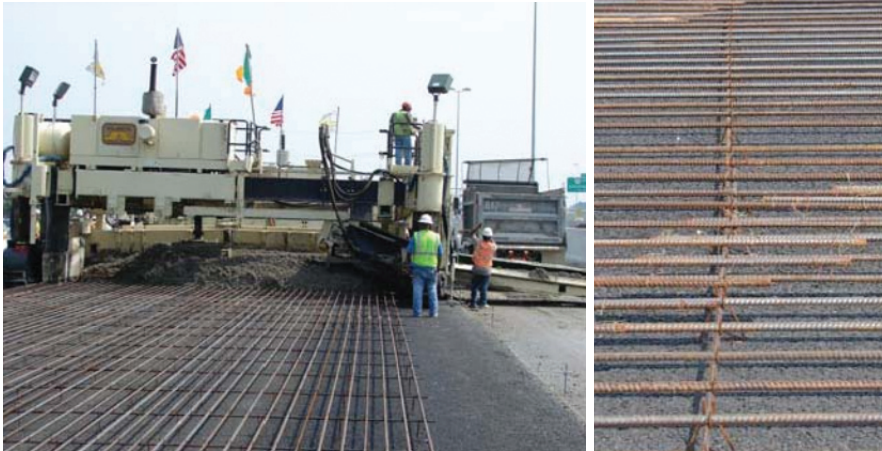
Steel reinforcement in CRC pavement (staggered laps of longitudinal bars shown on right).
